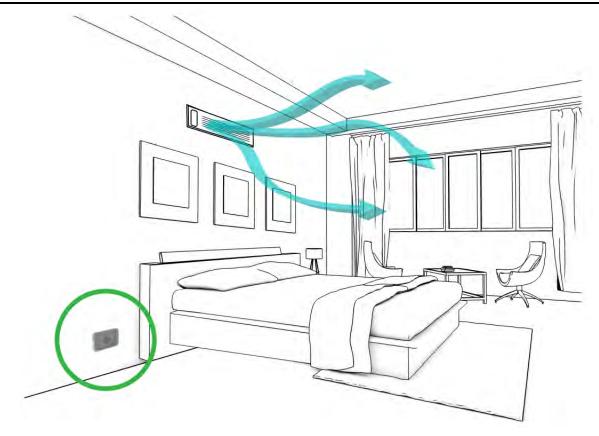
Typical MVR-300 Installation in an Occupied Space Application
